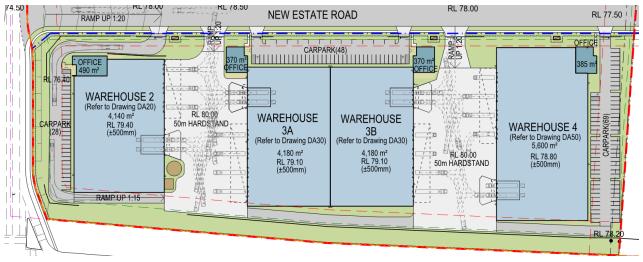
Warehouses 2, 3 & 4 – Site Plan
